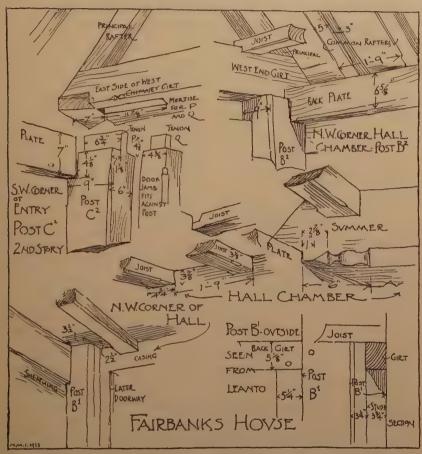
FRAMING DETAILS. FAIRBANKS HOUSE, DEDHAM, MASS.
